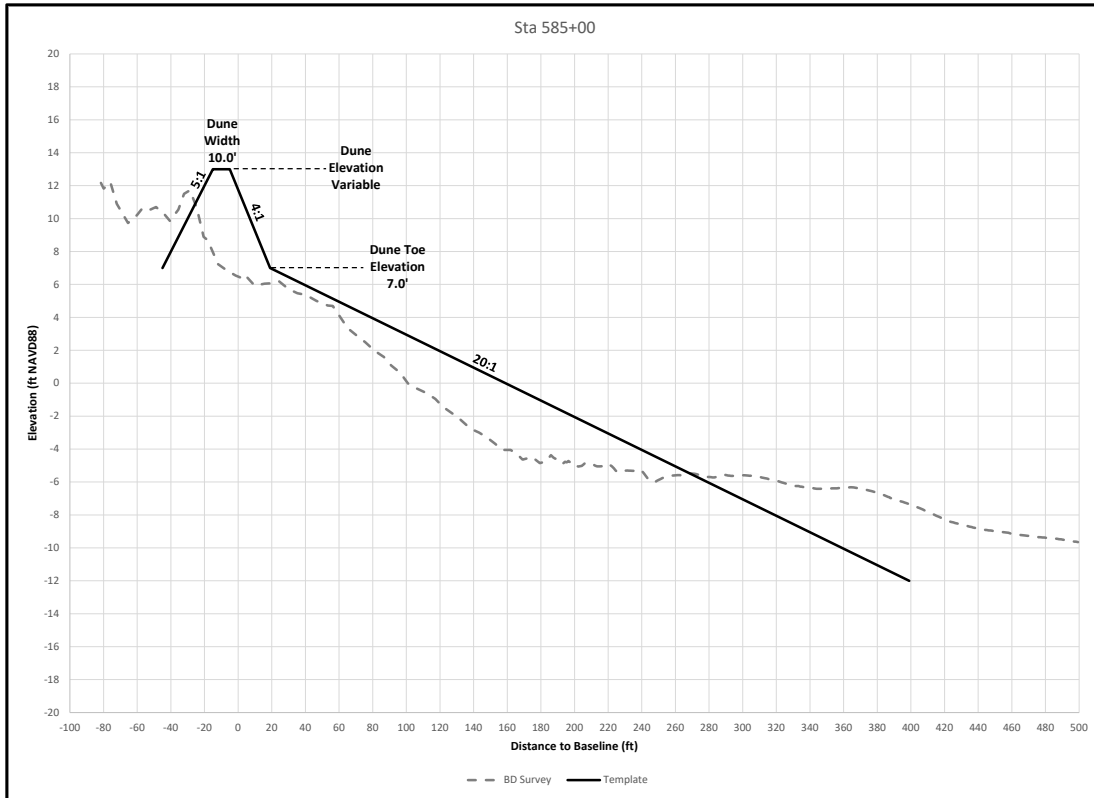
Beach Fill Typical Cross Section – No Berm
